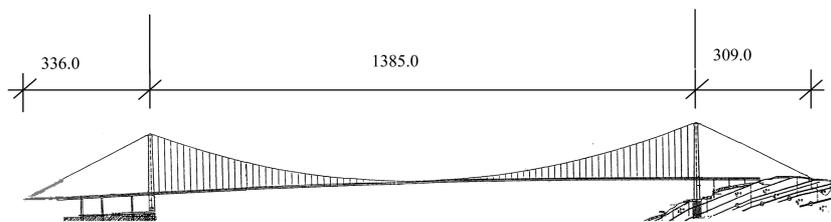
Elevation of Jiang Yin Bridge (Unit: m)
